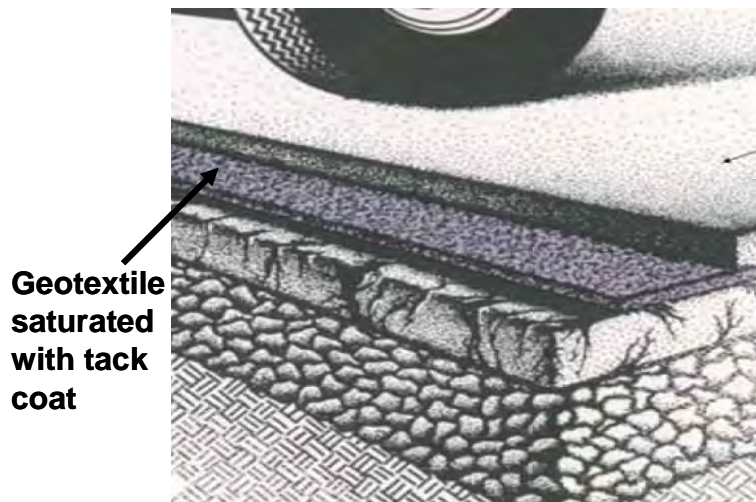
Geotextile used for mitigation of crack propagation in pavement overlay
